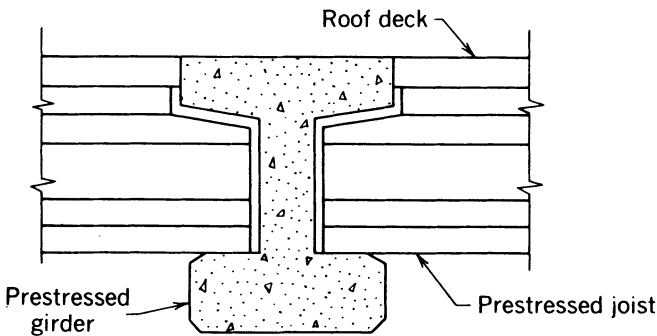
Cross section through girder supporting prestressed concrete joints.
